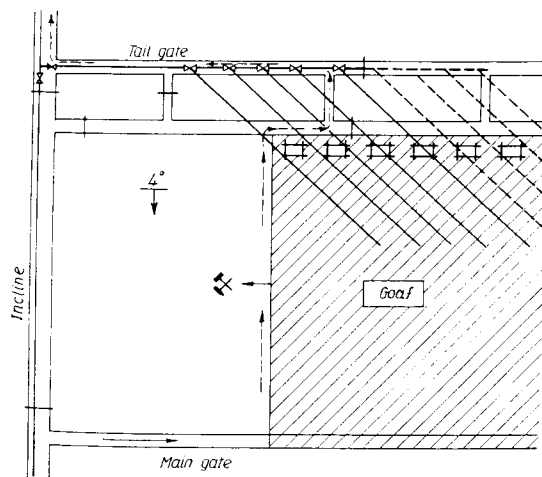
Retreating along-the-strike longwall system with roof caving and double ventilation drift
